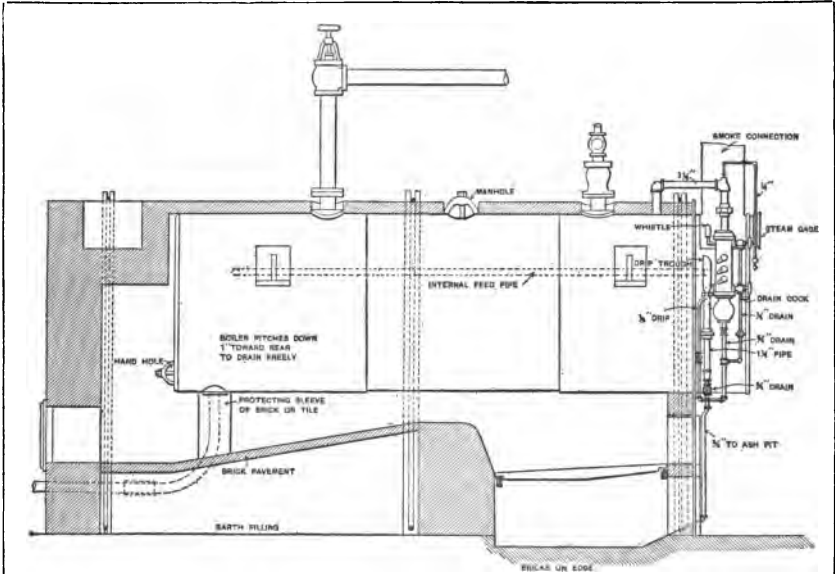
Section, Horizontal Tubular Boiler and Connections
